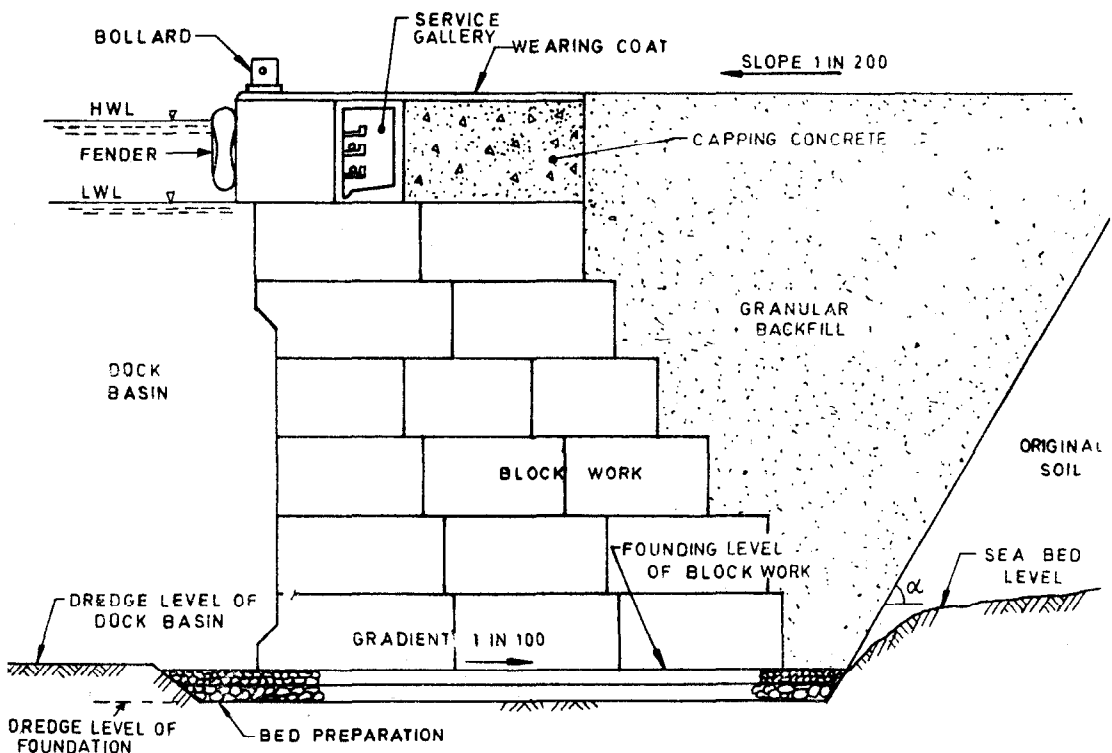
TYPICAL SECTION OF BLOCK WORK WHARF
